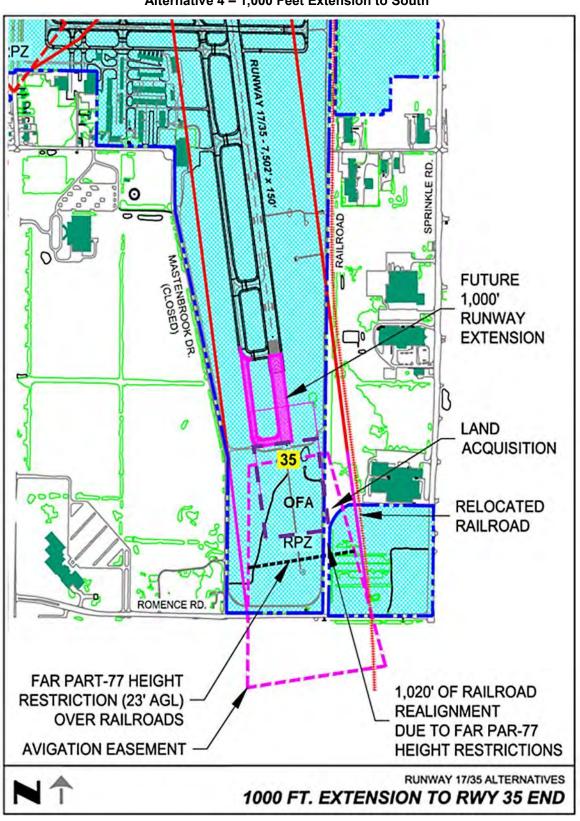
Alternative 4 – 1,000 Feet Extension to South
